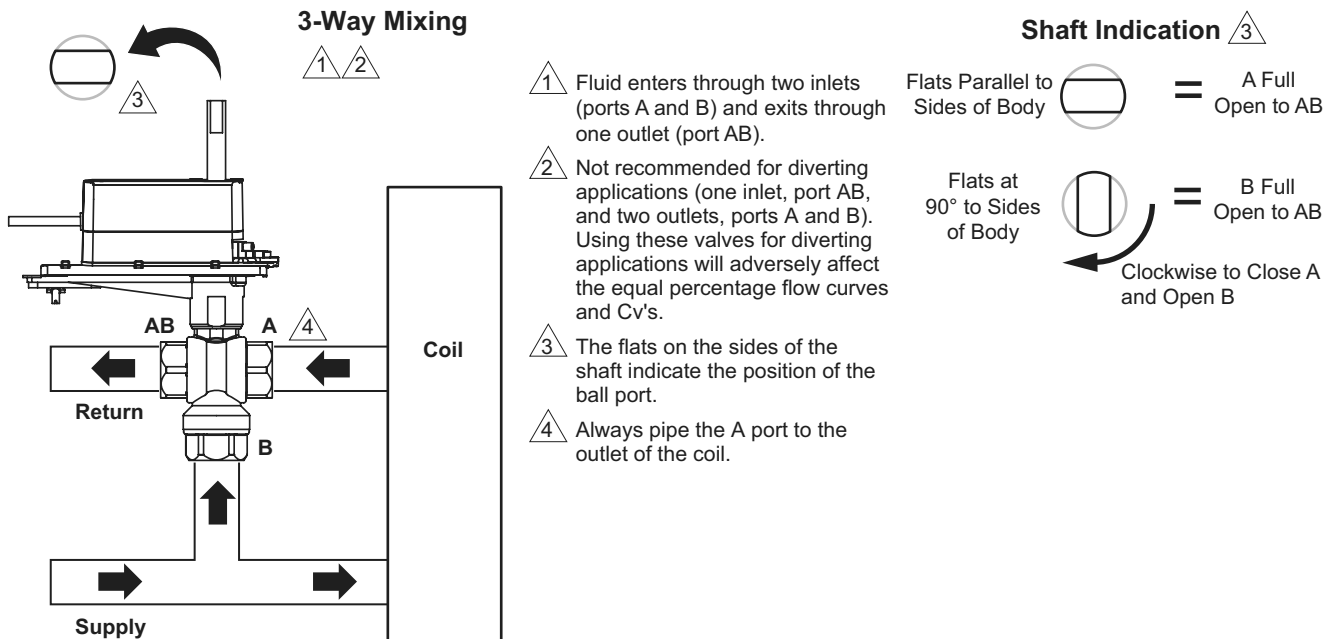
3-Way Mixing Valve Assemblies Piping Diagram.
